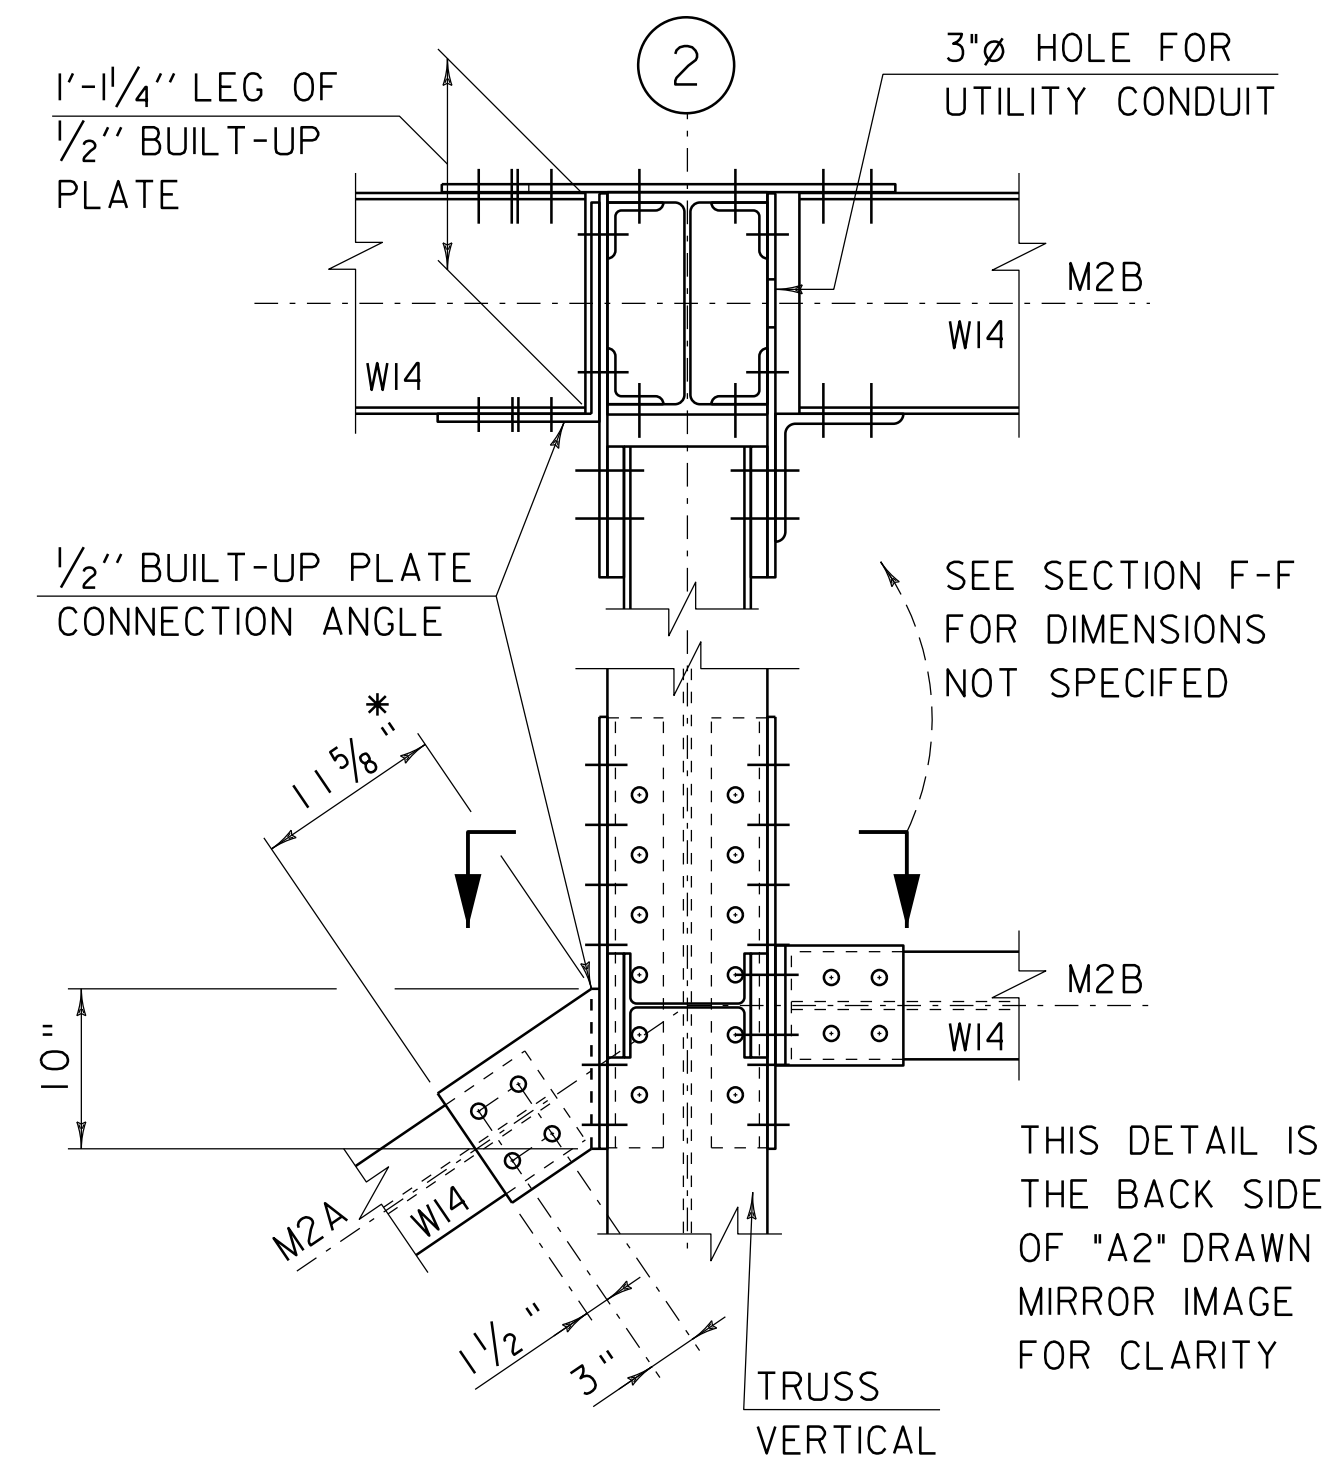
PLATE DIMENSIONS SHOWN MAY BE ADJUSTED BY FABRICATOR TO ACHIEVE PROPER FIT AND CLEARANCE AS REQUIRED.
